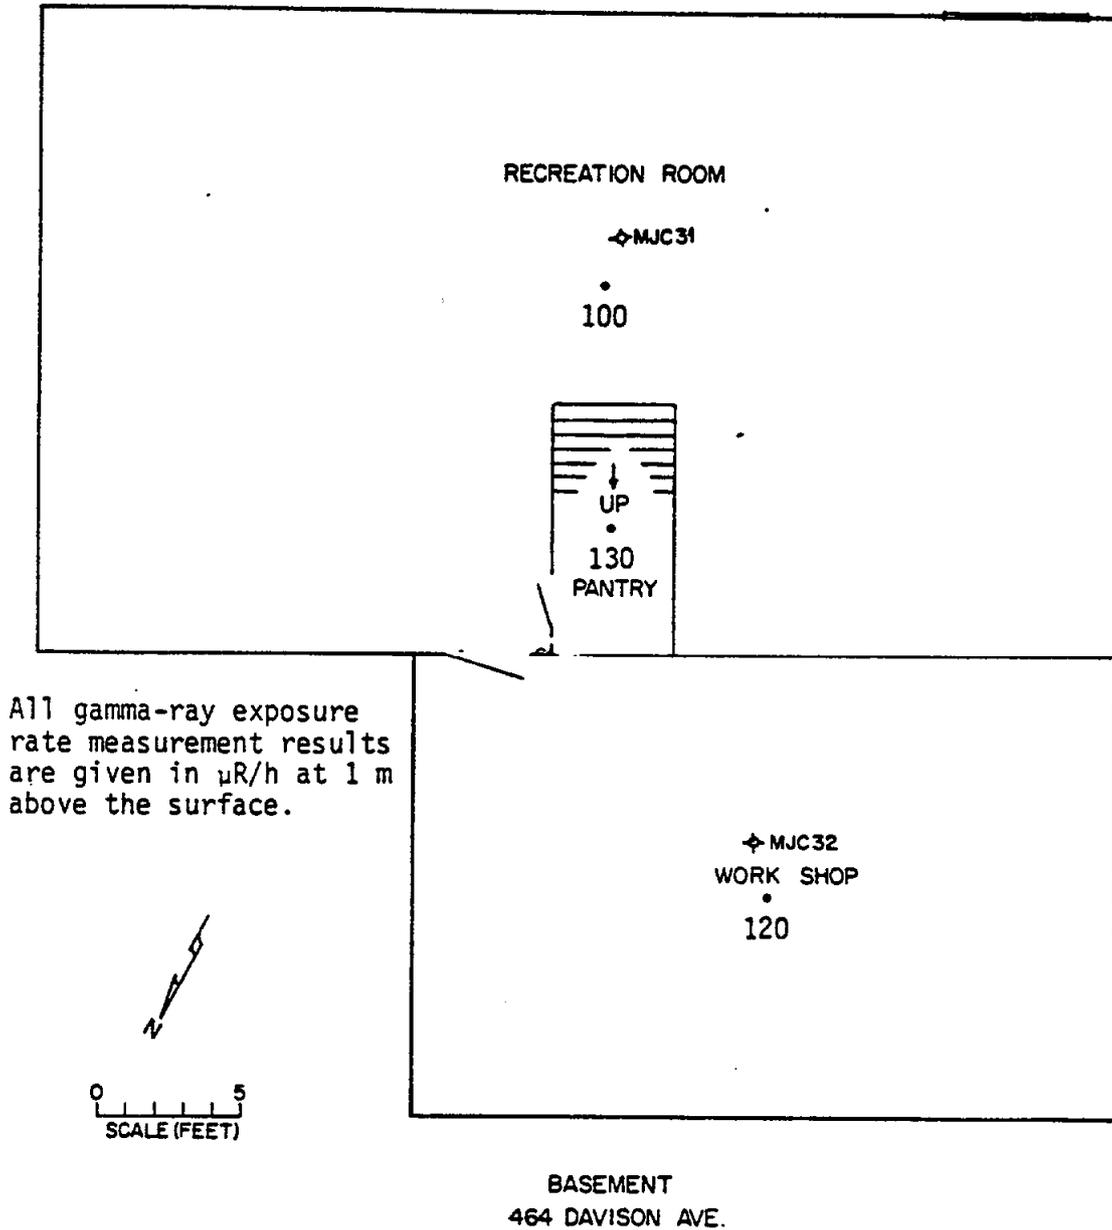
Schematic of the basement floor plan at 464 Davison Avenue showing locations of drill holes and external gamma-ray measurement results.
